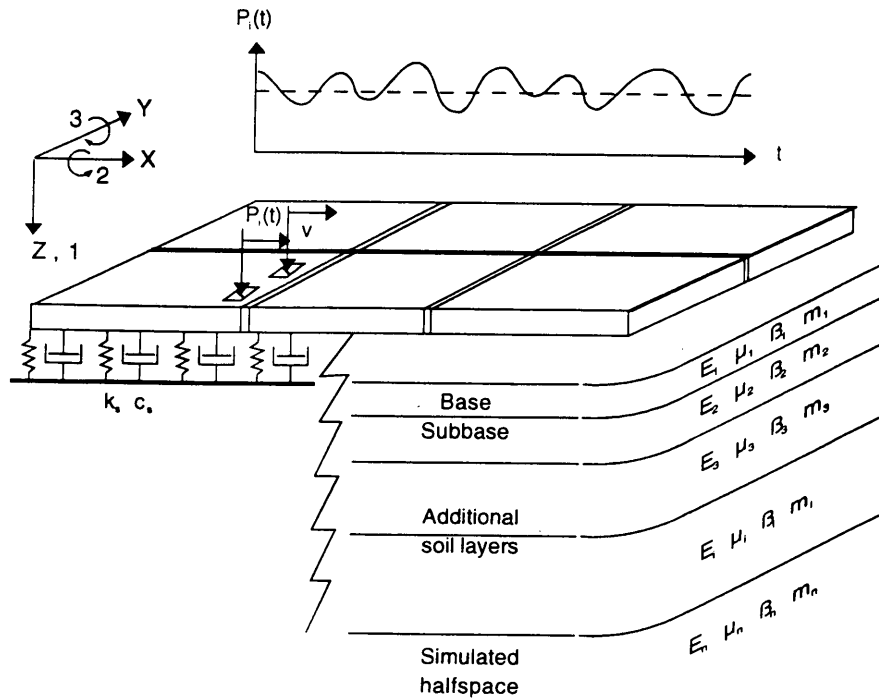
Schematic view of the DYNA-SLAB model, with damped Winkler foundation (LHS) and layered solid foundation (RHS).
